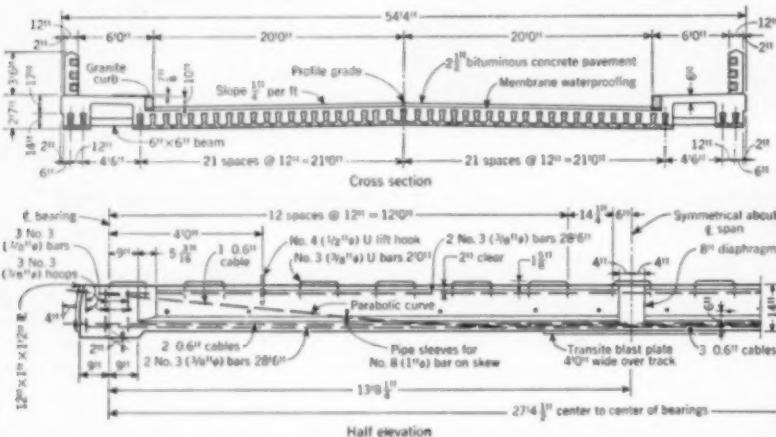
Floor system for Endicott Street Bridge in Danvers, Mass., over Boston & Maine Railroad, consists of 47 precast beams, post-tensioned with Roebling wire cables.
